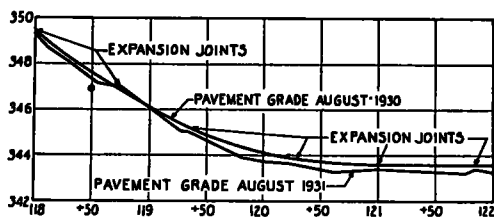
Sketch Showing Change in Pavement Grade. This pavement was constructed on subgrade that was ponded and jetted about 3 weeks prior to paving.
